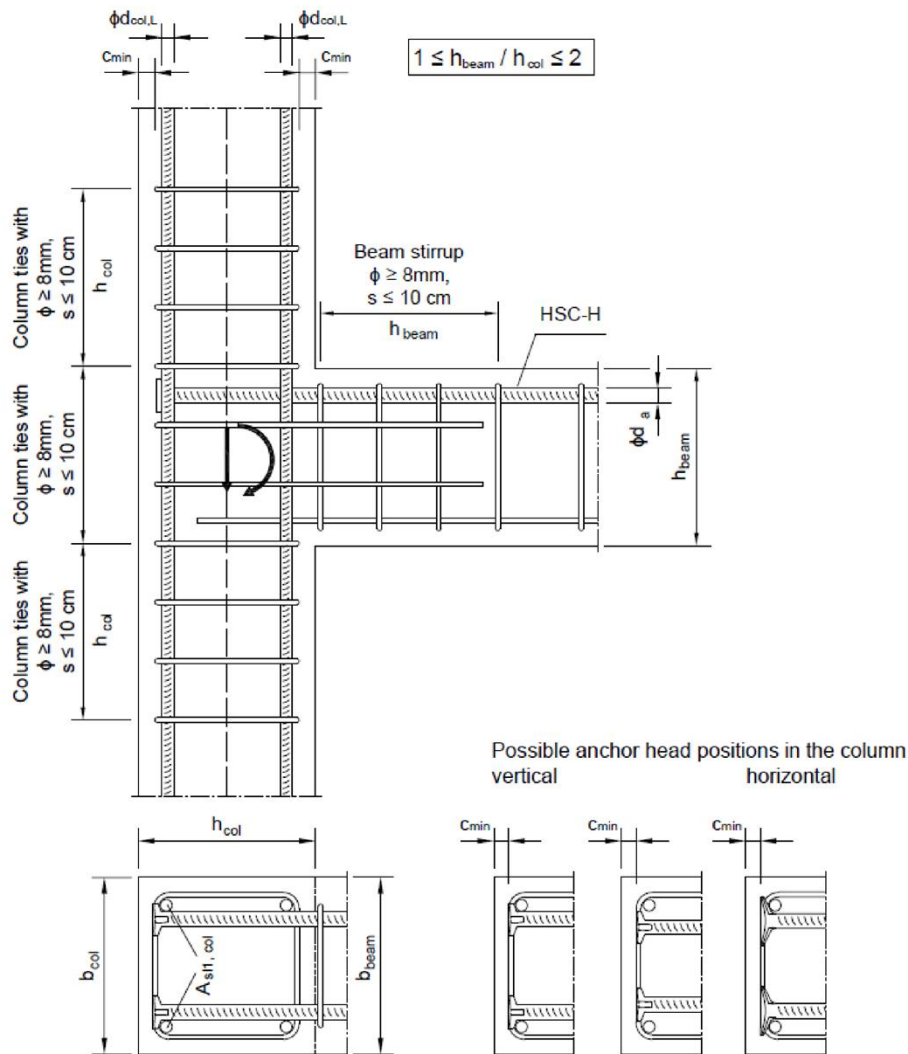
Dimensioning and detailing of exterior beam-column-joints
